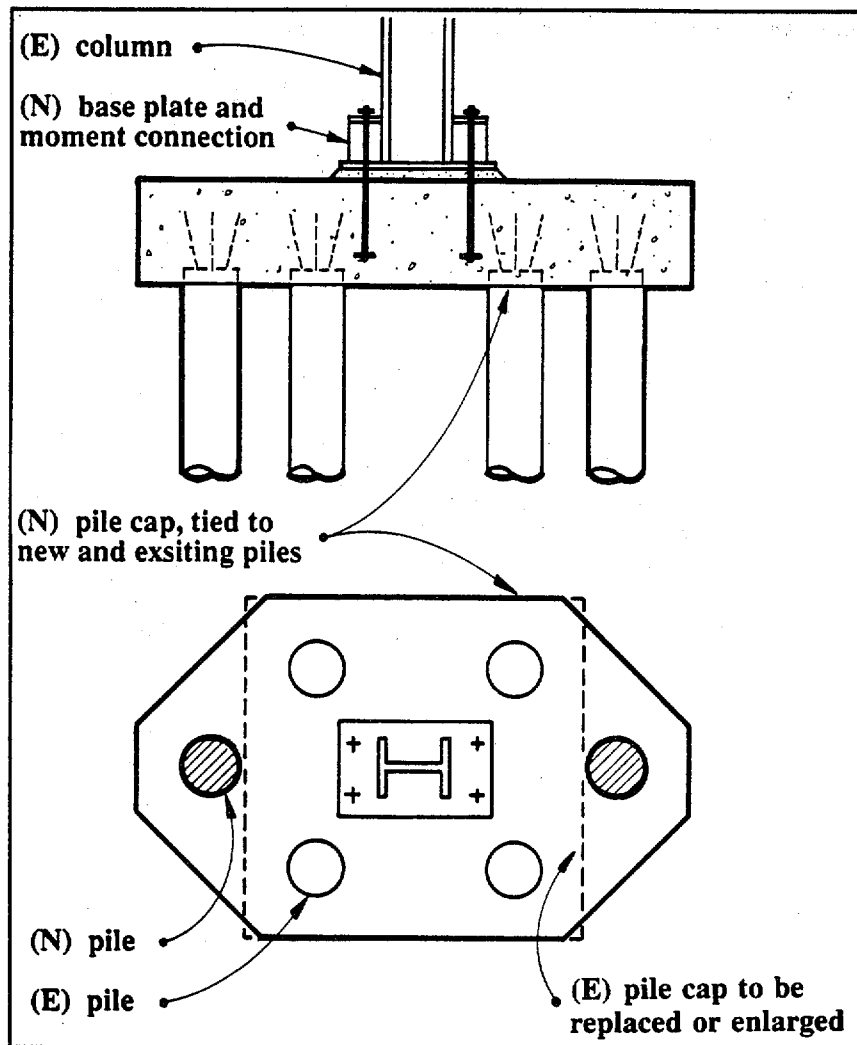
Upgrading an existing pile foundation.
